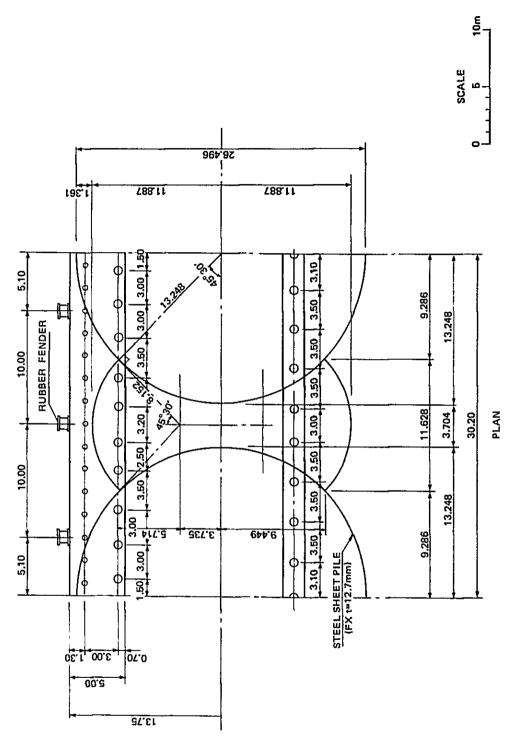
Container Berth Quay Wall (Steel Sheet Pile Cellular Cofferdom Type)
